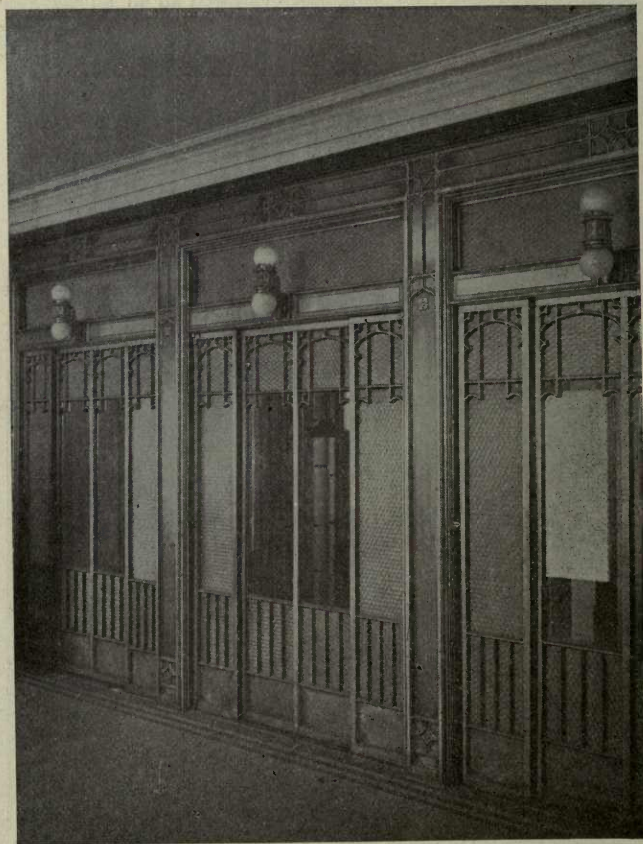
Upper Story Elevator Fronts, West St. Building, N. Y.,
